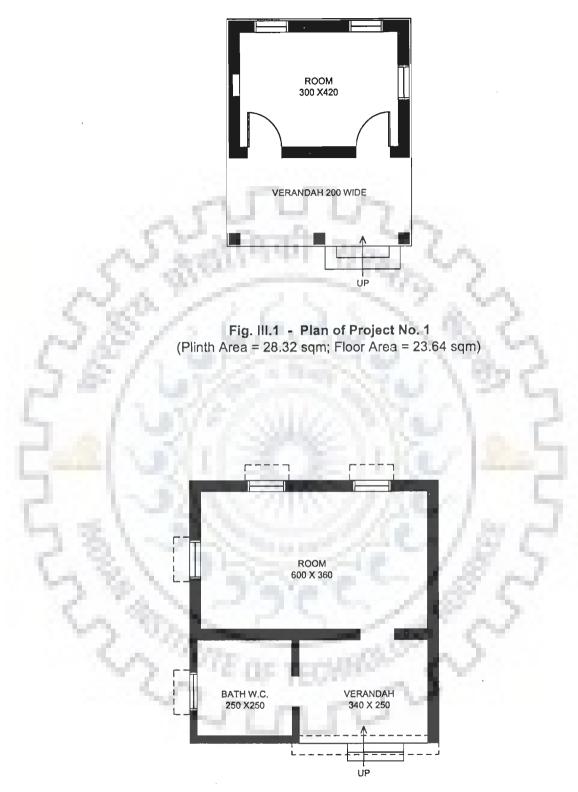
Plan of Project No. 2 (Plinth Area = 45.54 sqm; Floor Area = 36.35 sqm)
